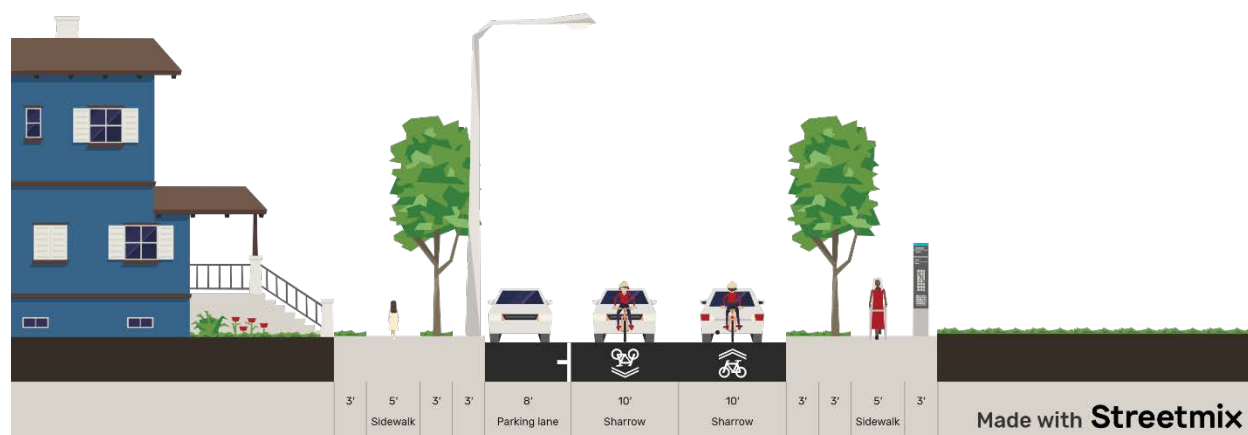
Street cross-section of Harmon Street facing north. The proposed street section includes a shared biking space with sharrow markings on the street. Additionally, there will be information signage on the right side to help navigate around the park area and the neighborhood. Diagram created in Streetmix by EC, 2023.
